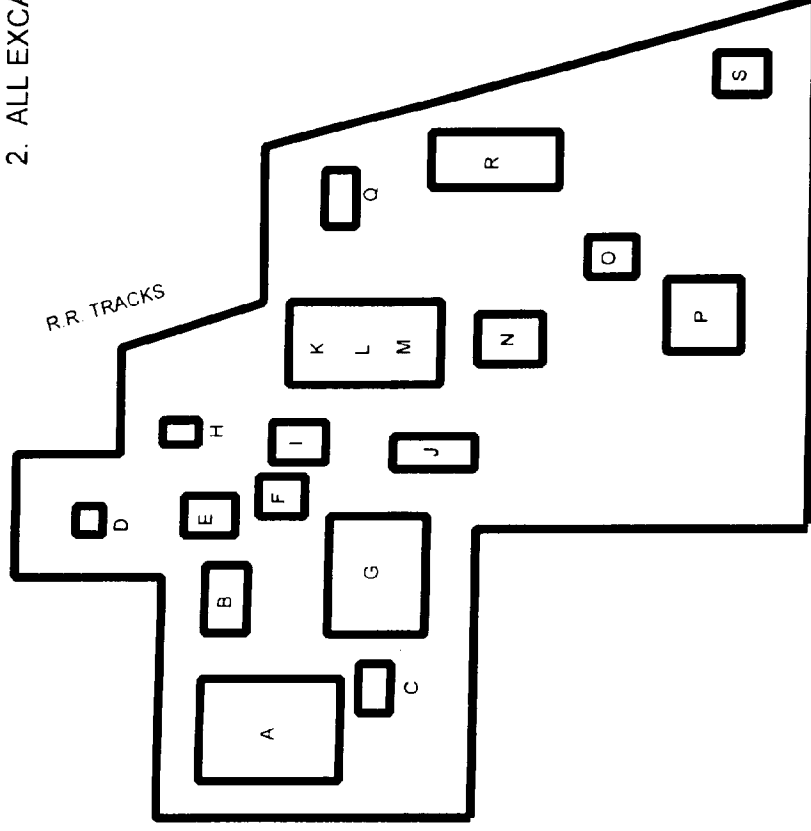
PROPOSED O.U. #3 LTLD REMEDY EXCAVATION AREAS
